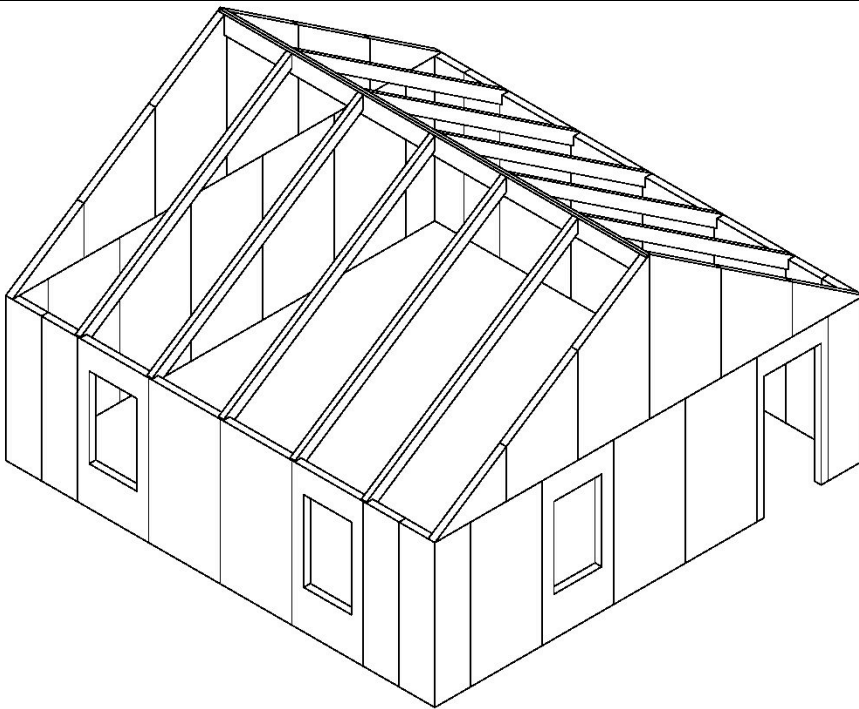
Temporary Bracing for Purlin and Ridge Beams: Temporary bracing for purlins is required while roof panels are installed to prevent spreading or movement. Bracing is removed after interior partition walls have been framed-in.
